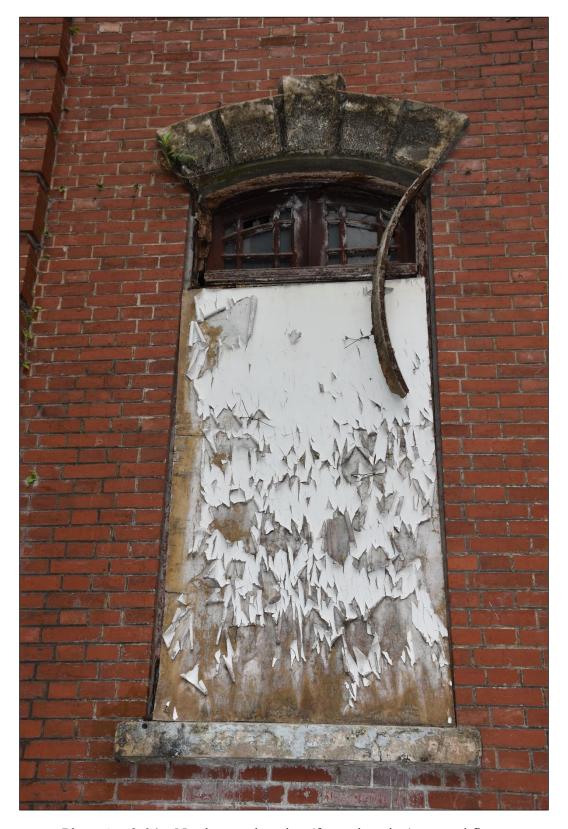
North-east elevation (front elevation), ground floor, window Wdw-Gf04, external side, covered with plywood panel, (21st March, 2023)
